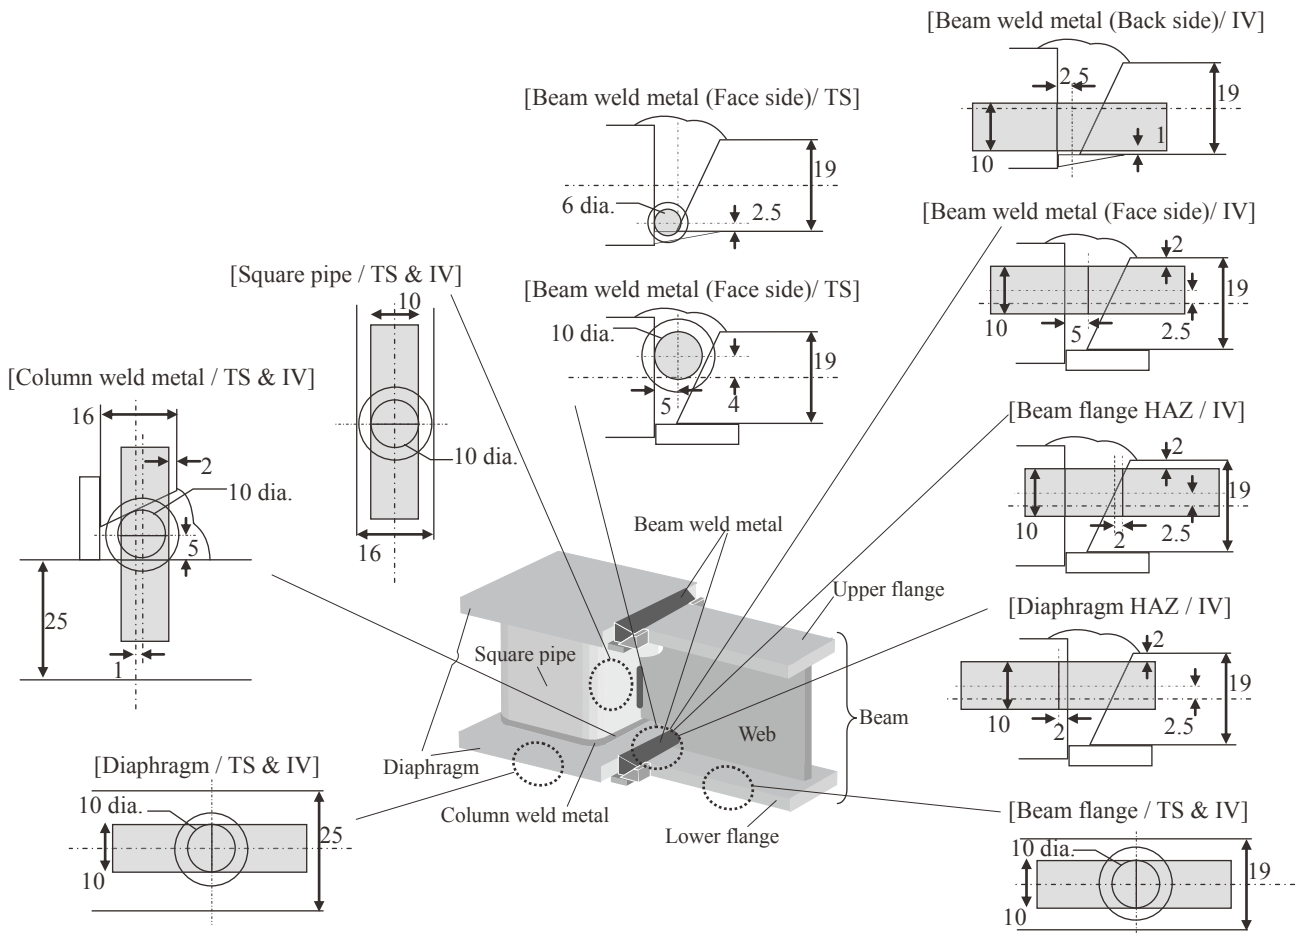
Position of mechanical test pieces about the base metals and weld metals
